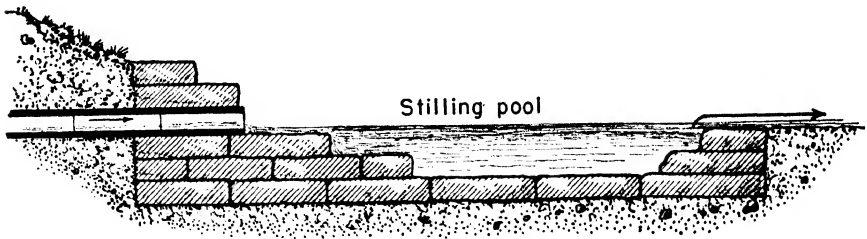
Outlet protection. Many tiling systems have failed because their outlets were not protected against such hazards as erosion and the trampling of livestock. Livestock prefer the cool water from the tile to that of shallow streams or ponds. Flat stones, flattish boulders, or concrete may be used for this purpose.
